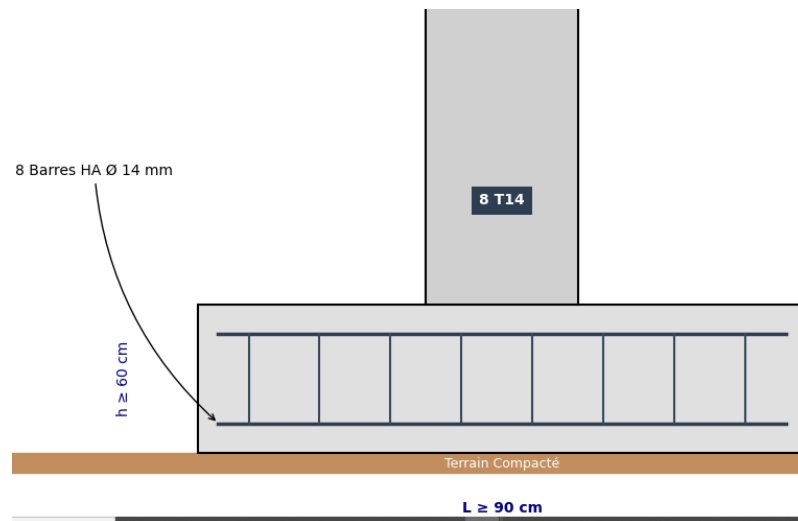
Typical Reinforcement Diagram for a Shallow Foundation (author)
